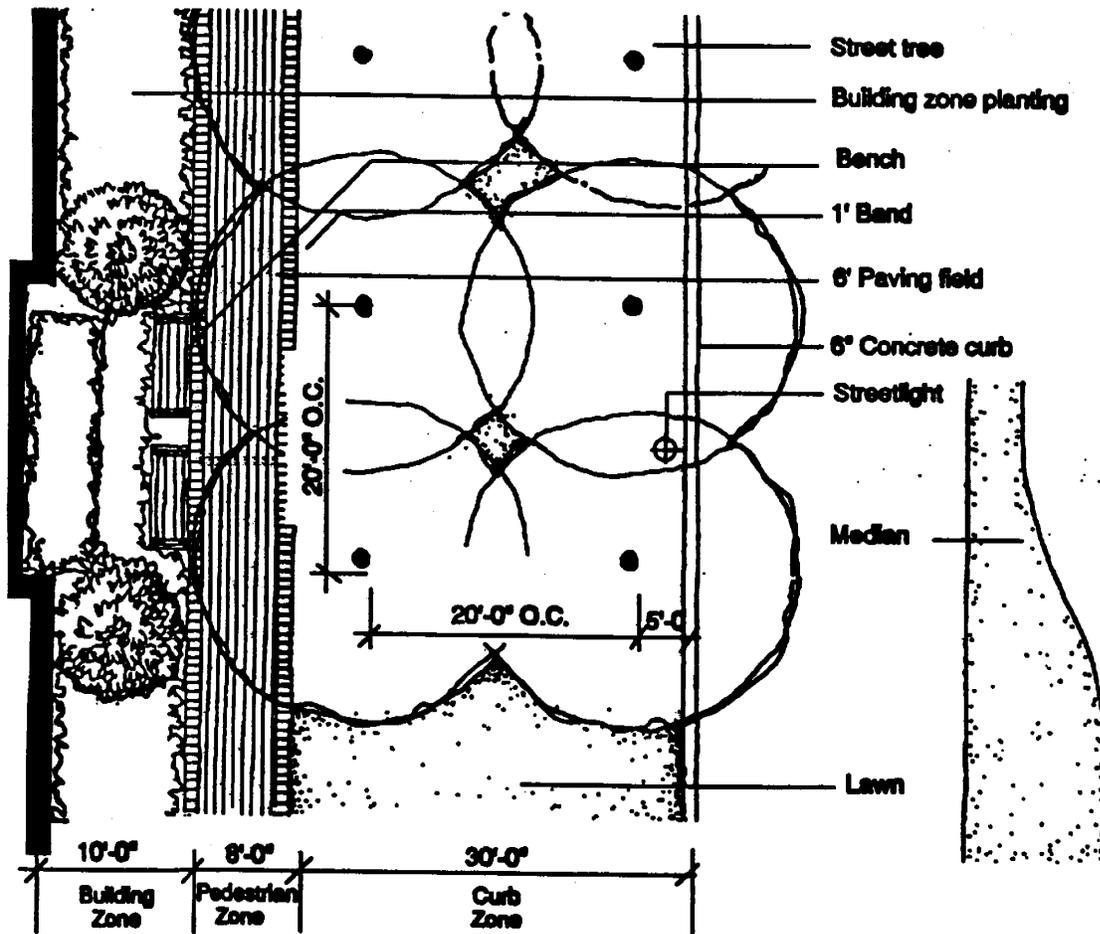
Eisenhower Precinct - Typical Streetscape Layout
